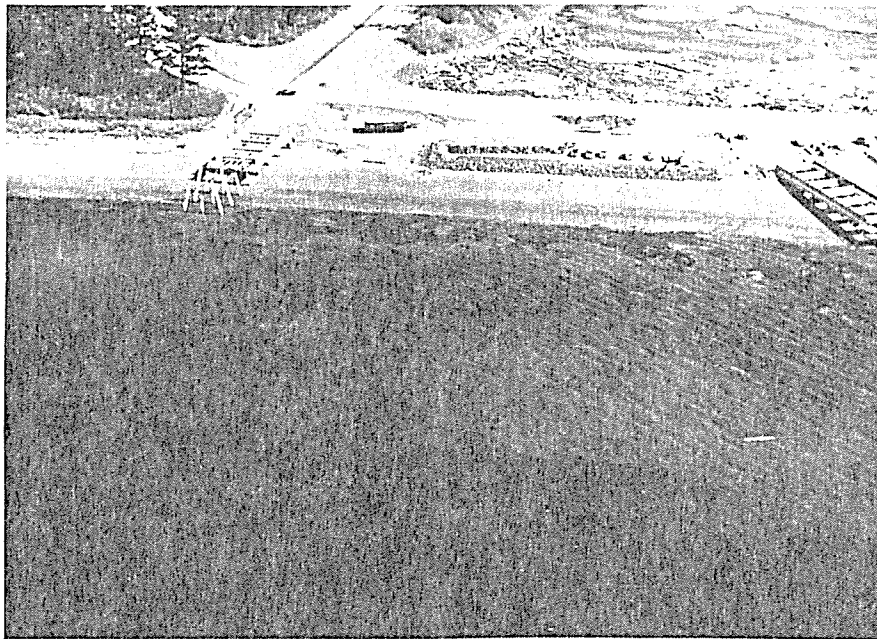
Aerial photos taken March and April 1977 at Walan Point and initial pier construction.
